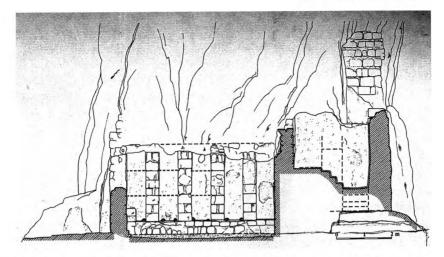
Cross-section of wall of niches and two adjacent rooms, looking south.
